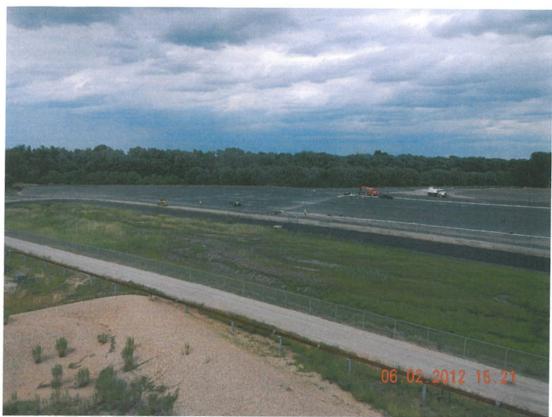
A - Destruct testing, archiving and shipping facing southwest
